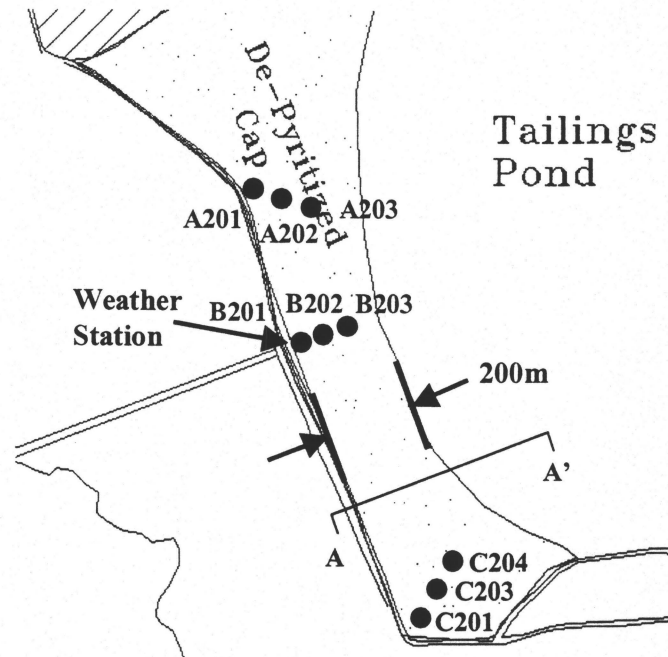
Site plan of tailings facility illustrating the location and designation of instrumentation.
